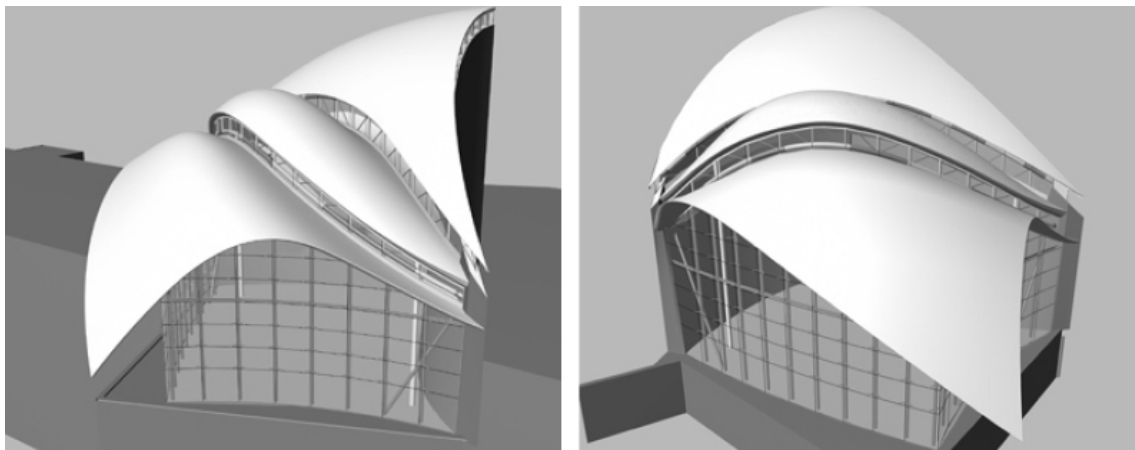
Roof wings of the Rabin Center<sup>48</sup>
